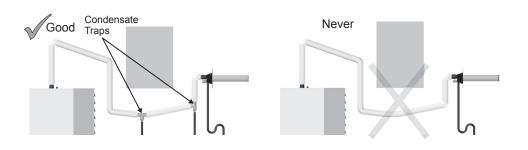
Condensate trap installation at low points in line and at horizontal to vertical transitions.
